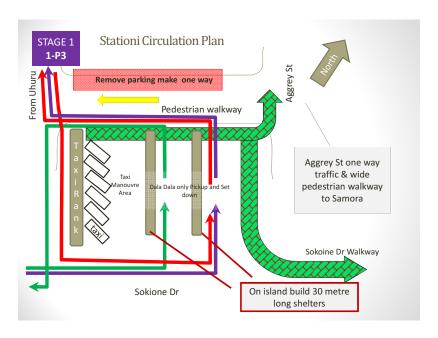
LAYOUT AND CIRCULATION PLAN
